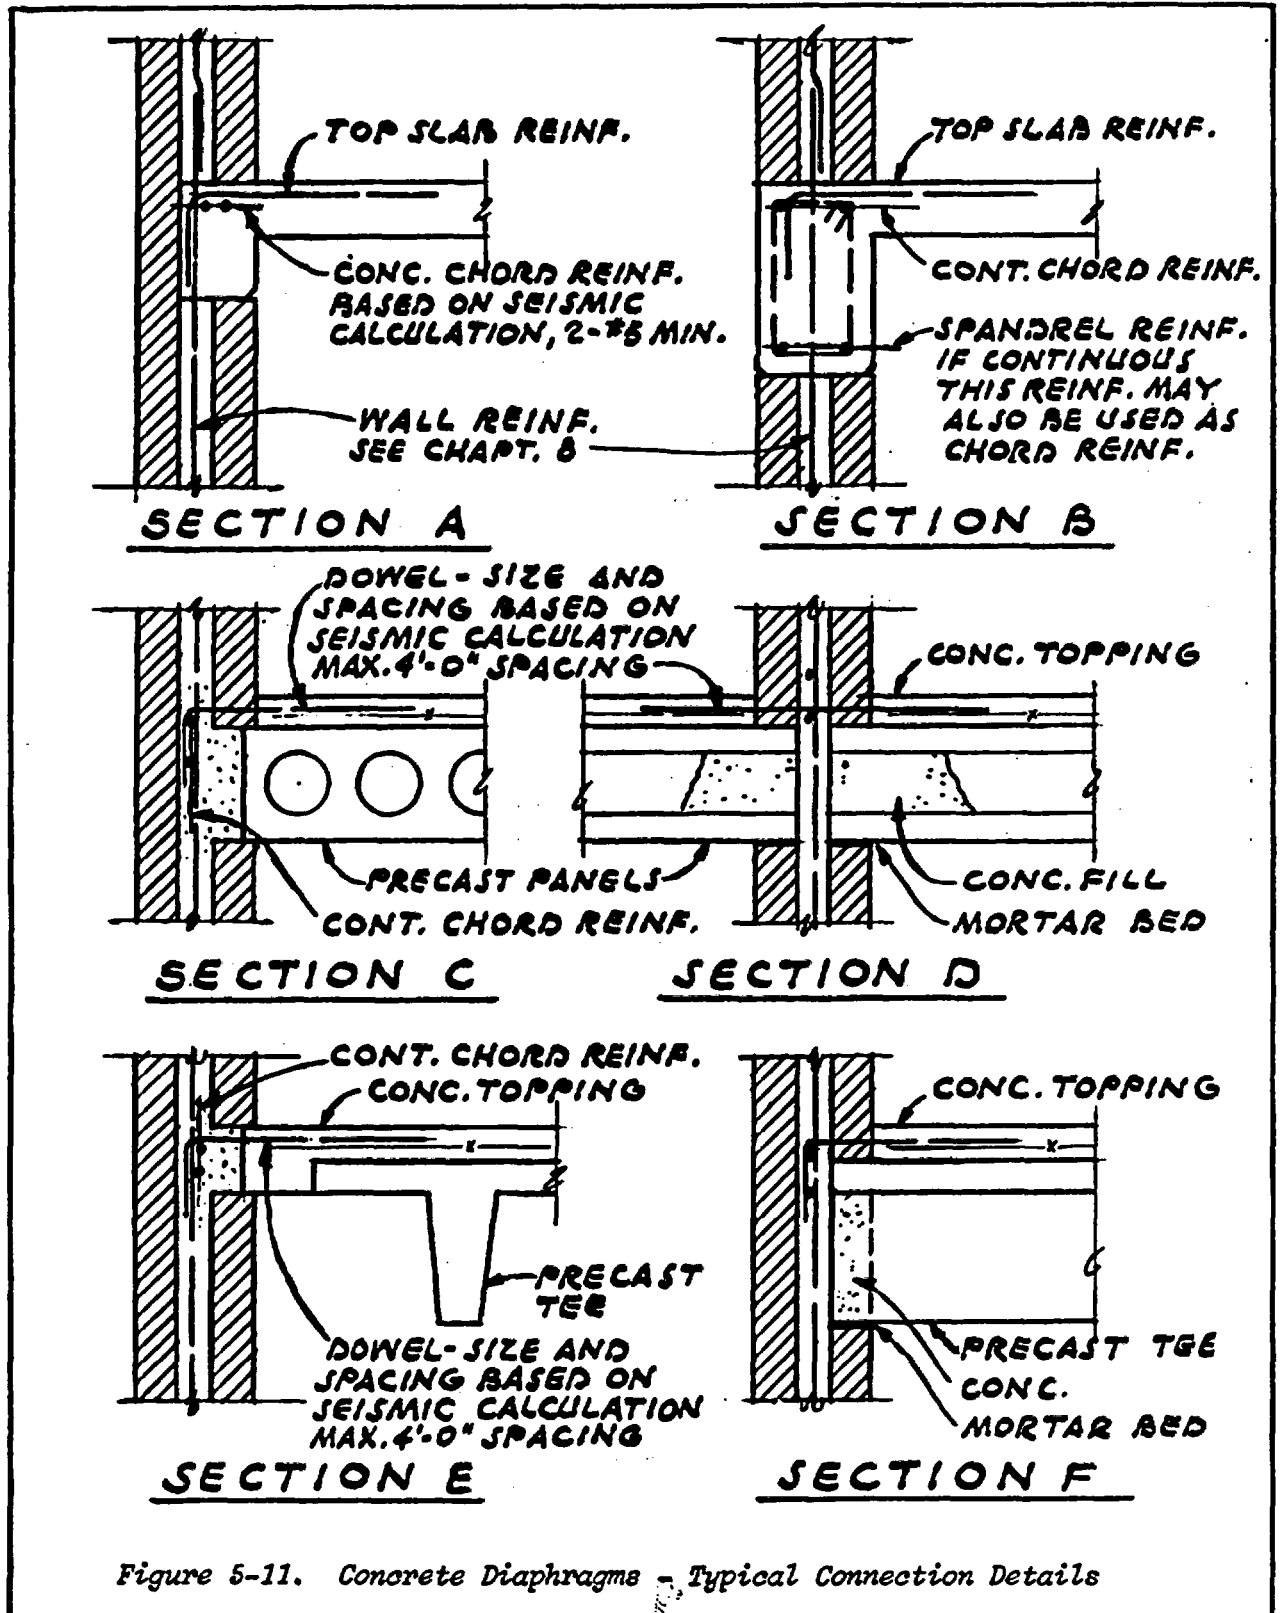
Concrete Diaphragms - Typical Connection Details
